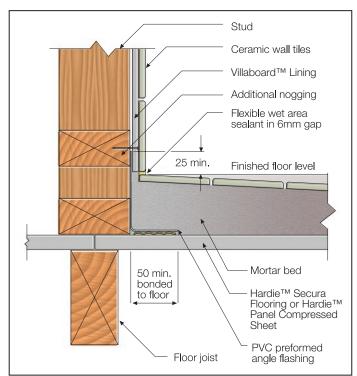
EXTERNAL PERIMETER FLASHING - VILLABOARD™ LININGS FINISHED WITH TILES
